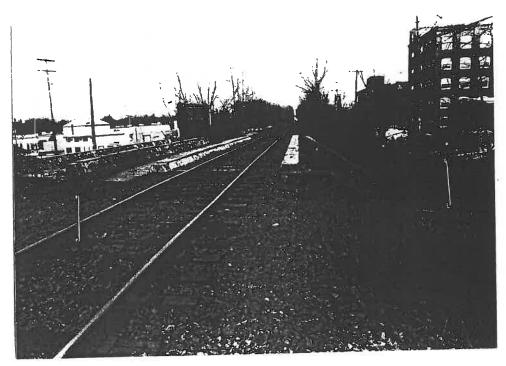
description: Thru Rolled Girder Bridge over Rt. 1A, Portsmouth (55.83)
